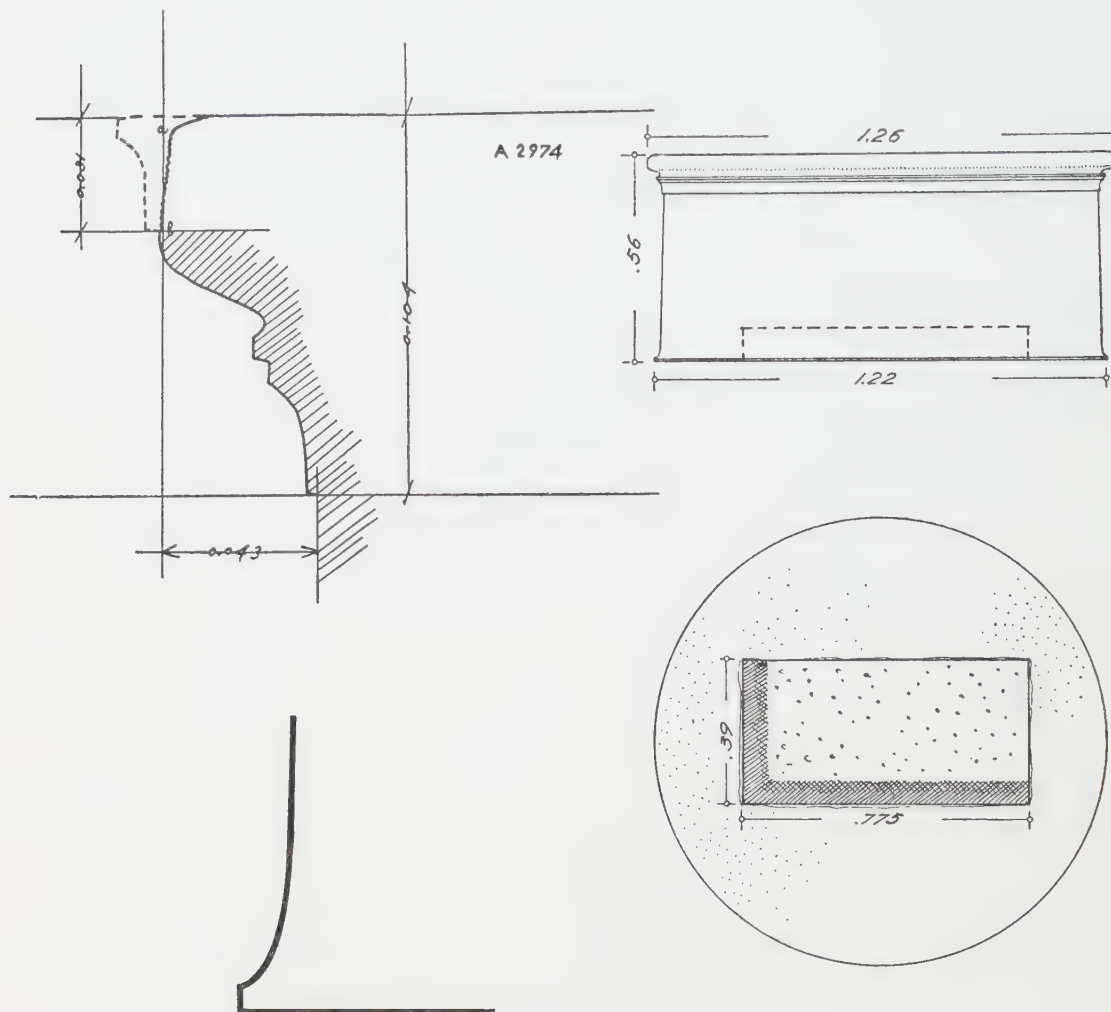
Round Monument Base (A 2974). Mouldings, Elevation and Plan of Original Underside.
